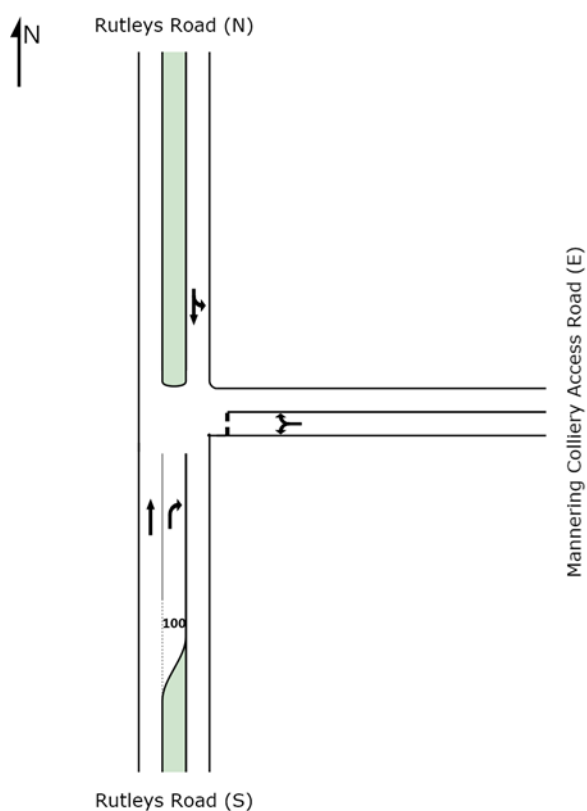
SIDRA layout of the proposed Rutleys Road/Mannering Colliery Access Road intersection upgrade
